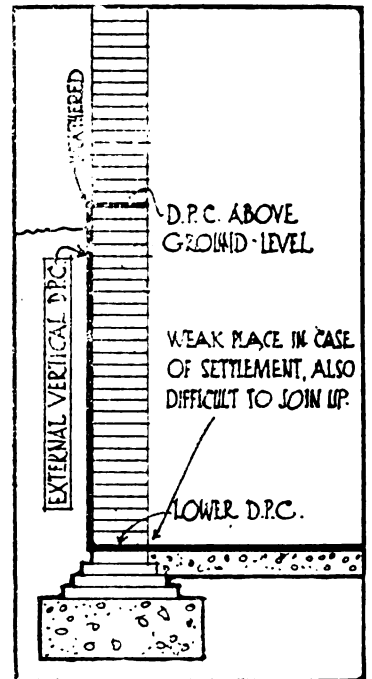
New basement wall with vertical and two horizontal damp-courses.
